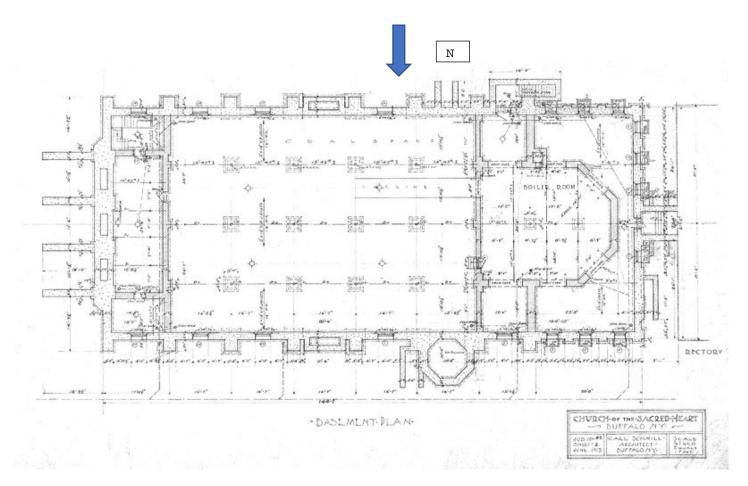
Basement Plan, Church of the Sacred Heart (1913) Carl Schmill, Architect Not to scale
